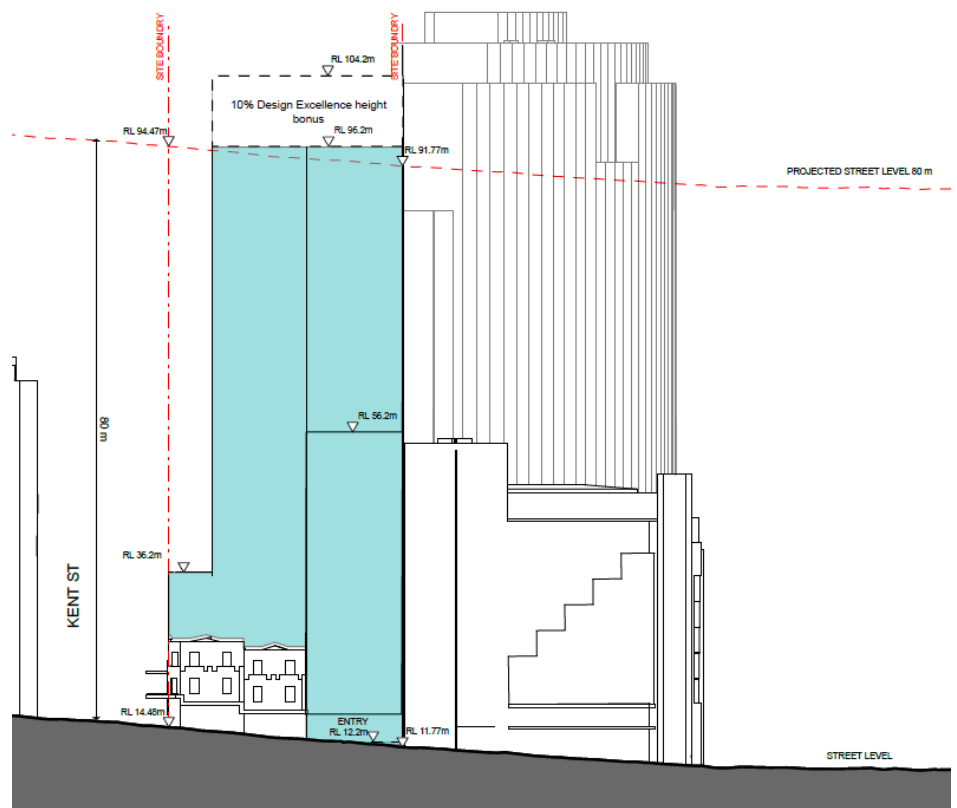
Proposed Building Envelope North (Erskine Street) Elevation
